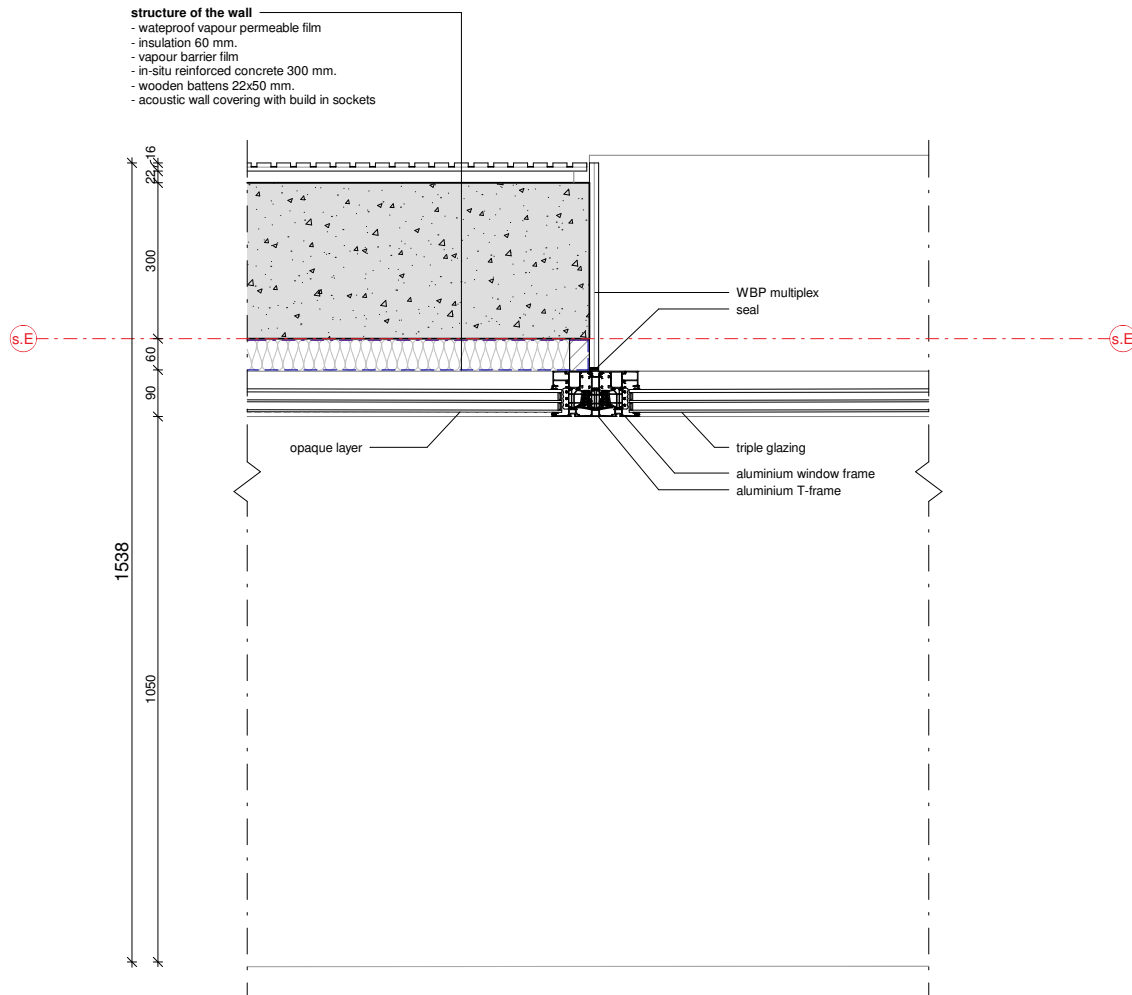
Horizontal detail of the typical facade element (own drawing)
